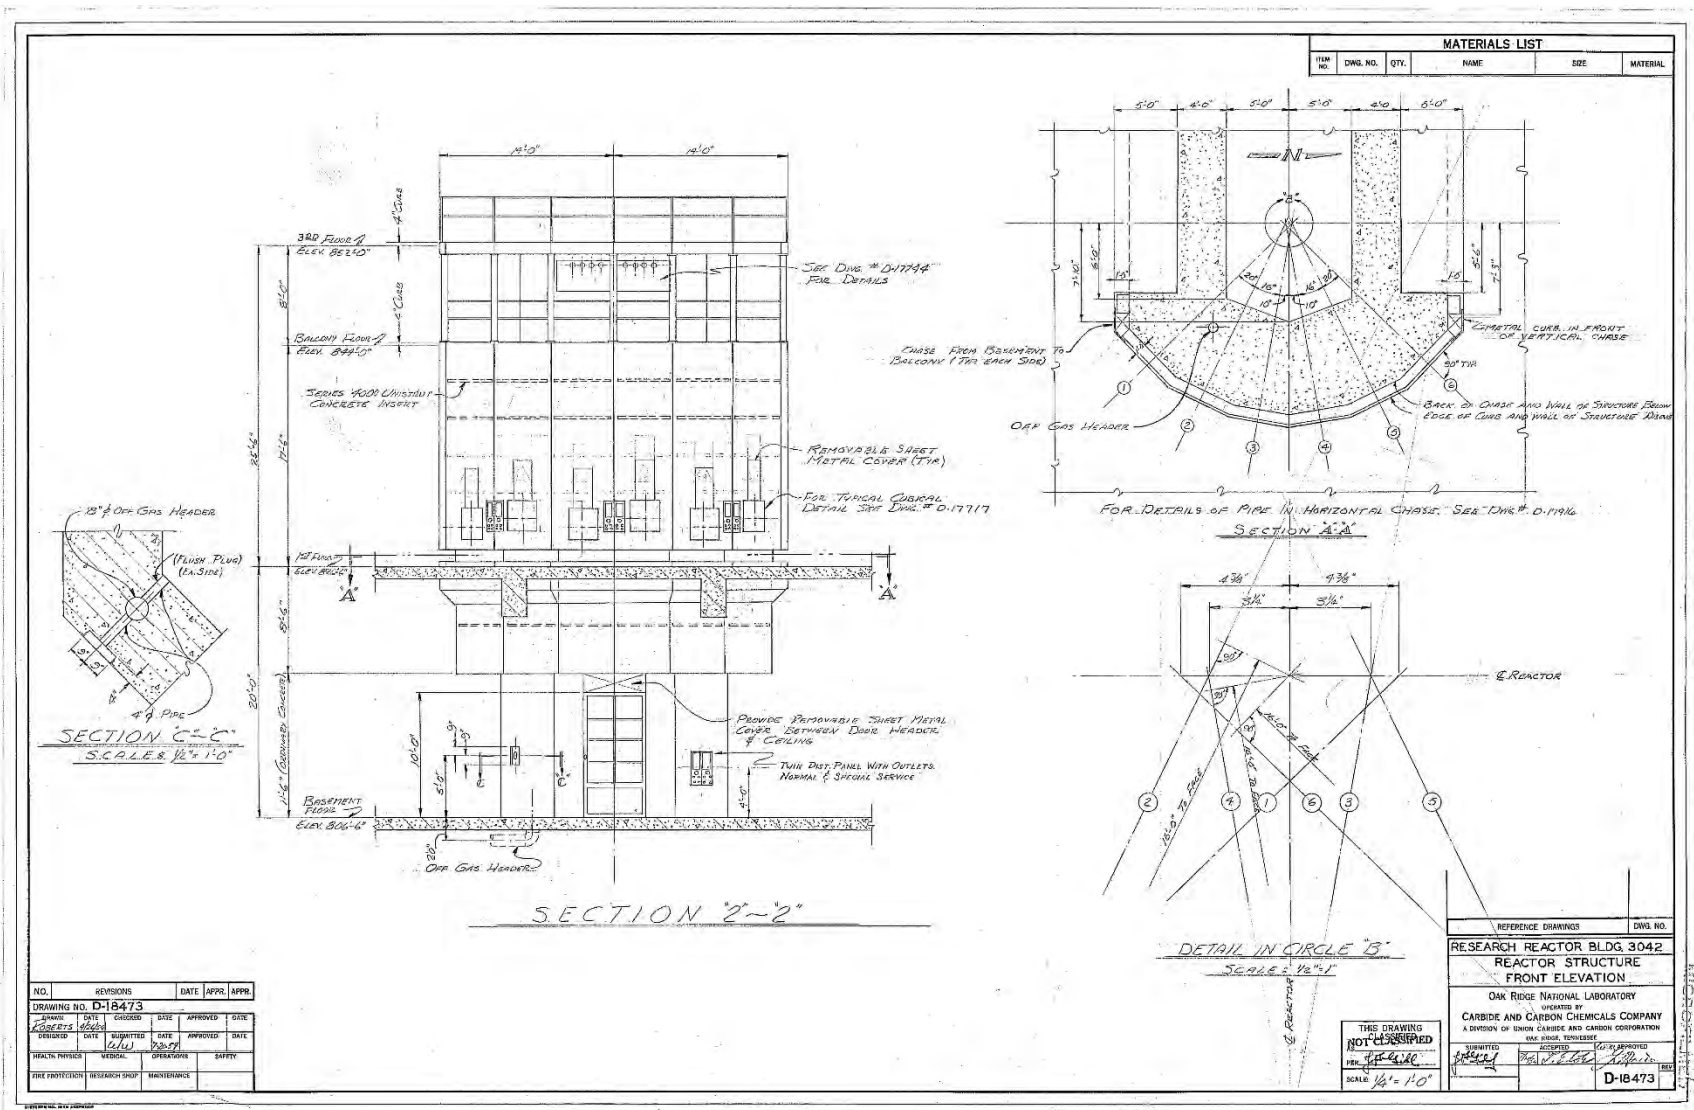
Front elevation of the Oak Ridge Research Reactor structure in Building 3042 (Oak Ridge National Laboratory, April 26, 1954).
